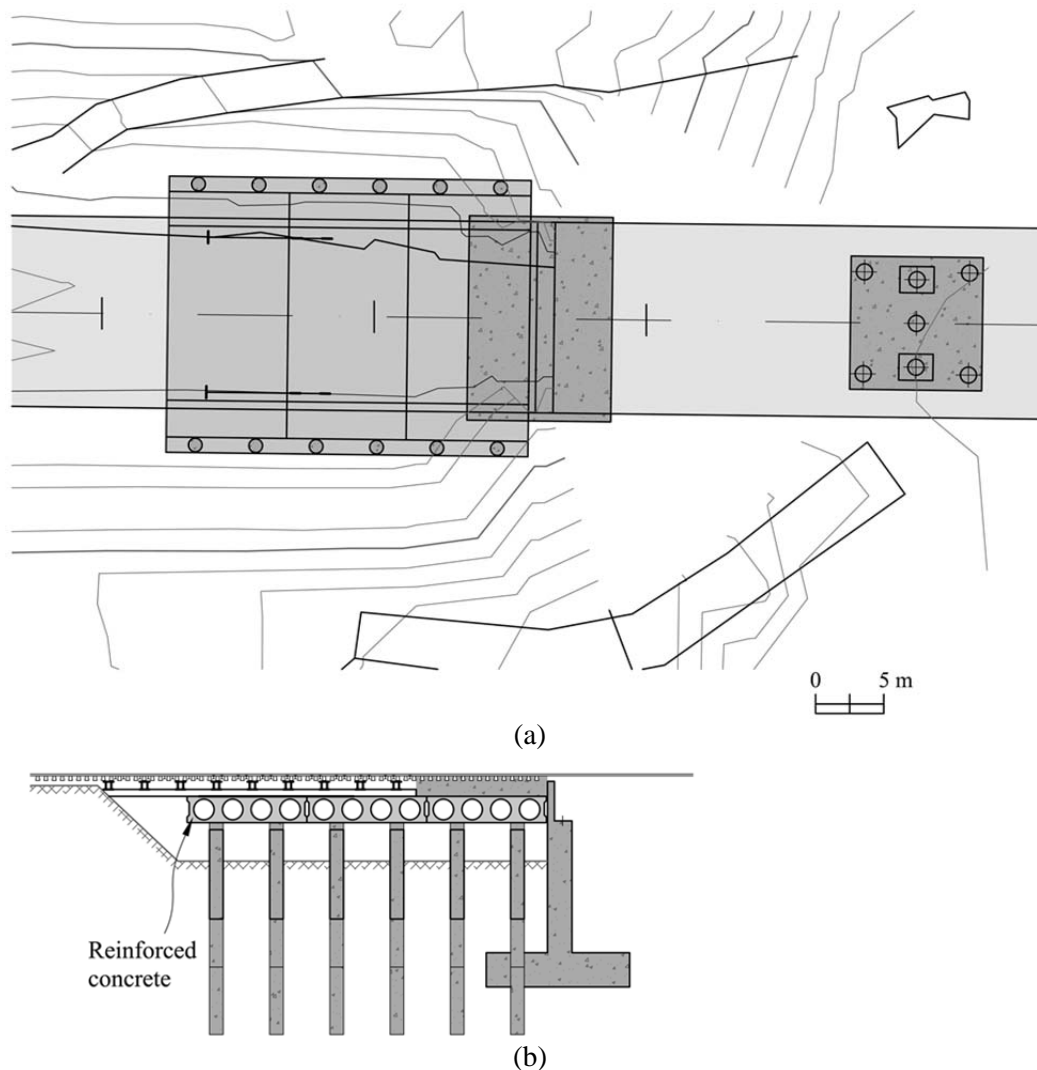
Design of repair solution: (a) plan view of slabs founded on piles; (b) longitudinal section showing excavation, underpinning of rail tracks, supporting reinforced slabs and piles
